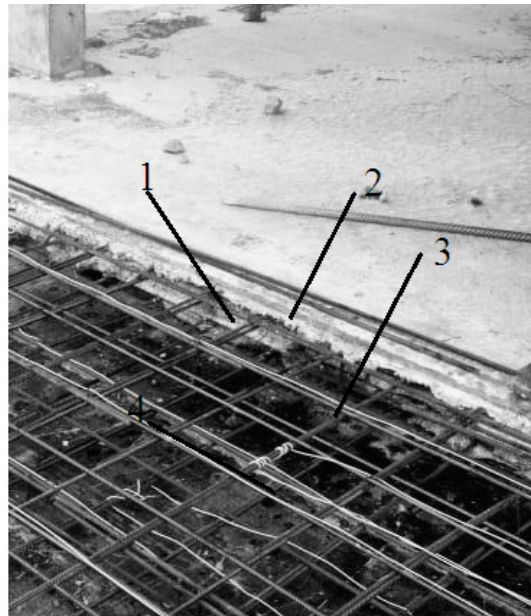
Construction joint structure: 1 - metal grid; 2 - protective concrete layer; 3 - top reinforcement; 4 - bottom reinforcement.
